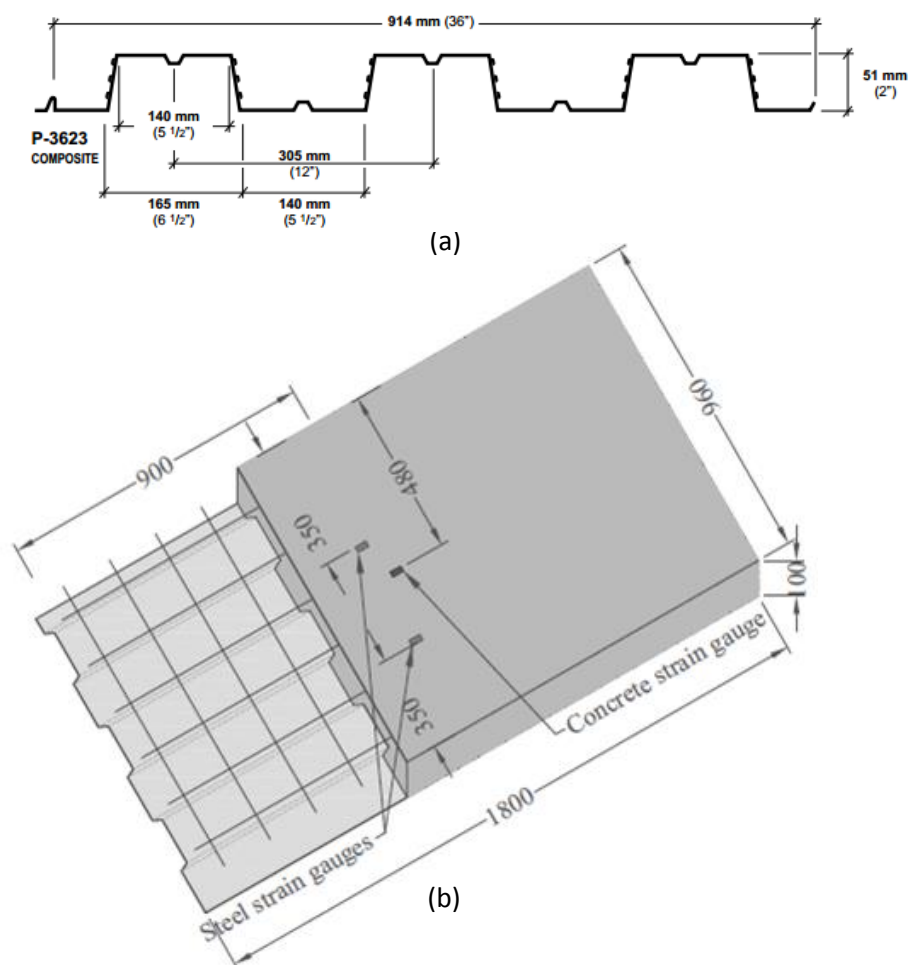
(a) Dimensions of P-3623 steel deck (Canam Group 2006), (b) 3D model of composite-3623 steel deck slab (Hossain et al. 2014)
